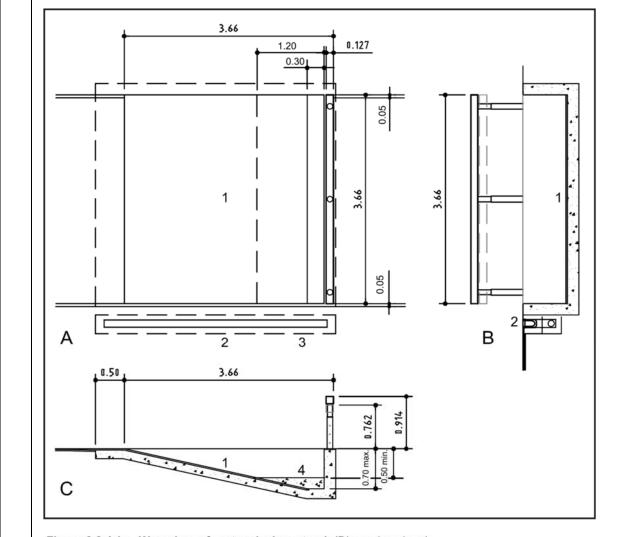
Water jump for steeplechase track (Dimensions in m)
